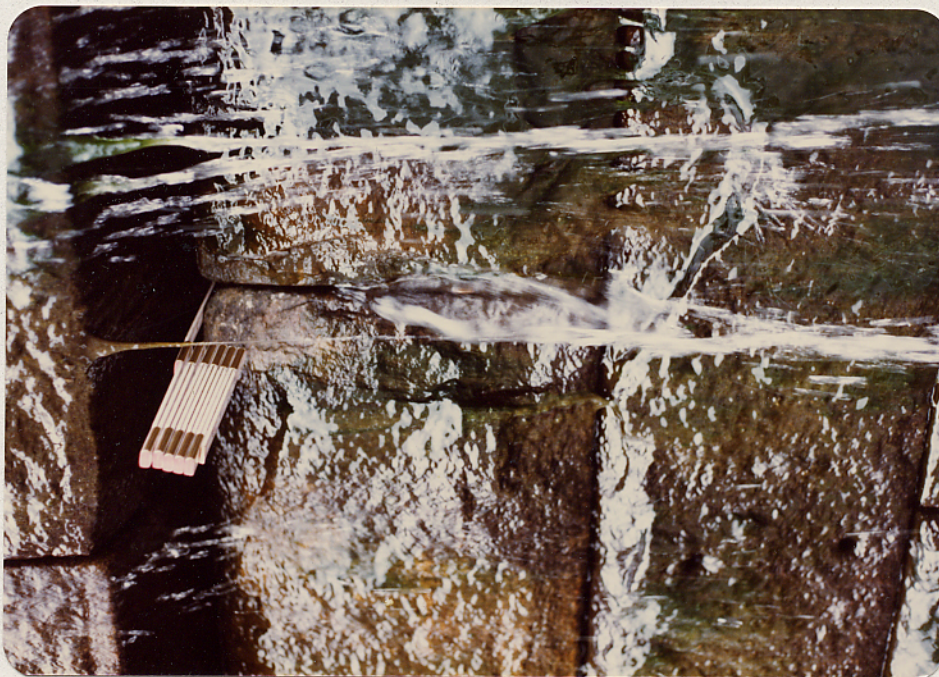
Possible seep in forebay dam approximately 25 feet from left abutment and two feet below crest (April, 1979).
